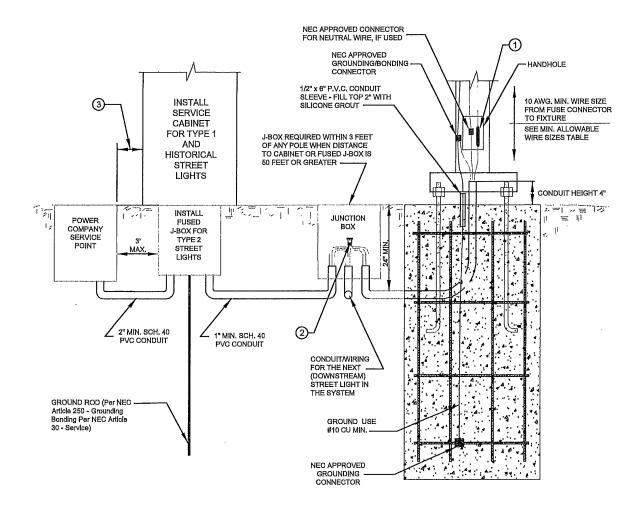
DETAILS FOR STREET LIGHT BASE INSTALLATION STANDARD DRAWING NO.
